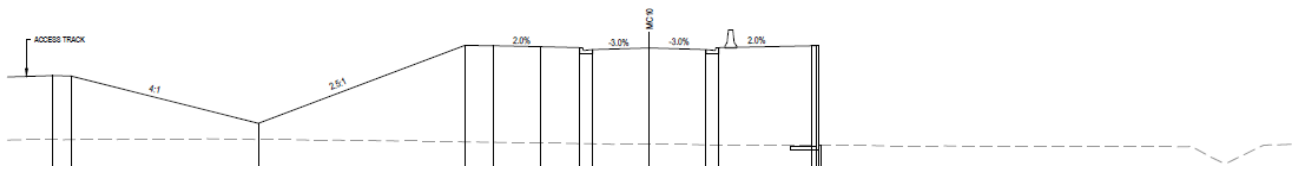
Indicative typical cross-section of alignment near East Hills Railway bridge
